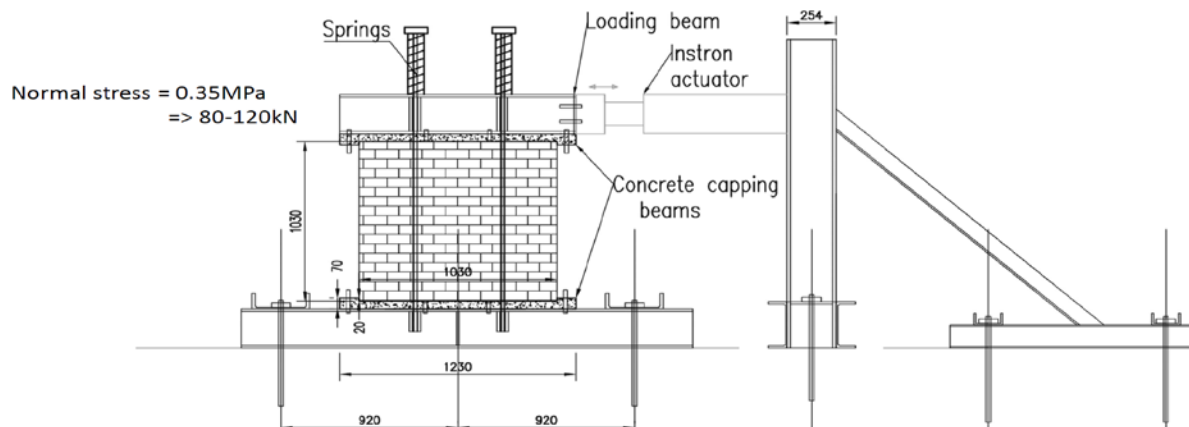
Shear wall test setup shown schematically. (Dimensions in mm.)
